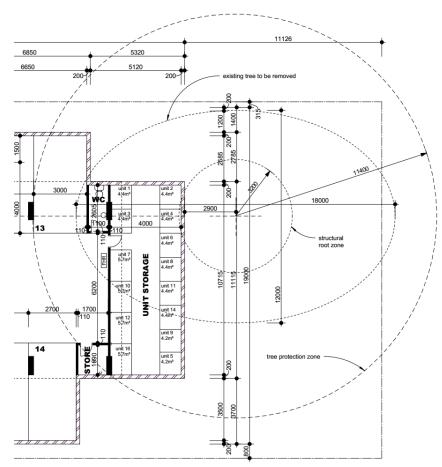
Basement Floor Plan showing (from centre) the structural root zone, canopy spread, and tree protection zone, of the existing Jacaranda mimosifolia (MacGillivray Architects, 2017)
